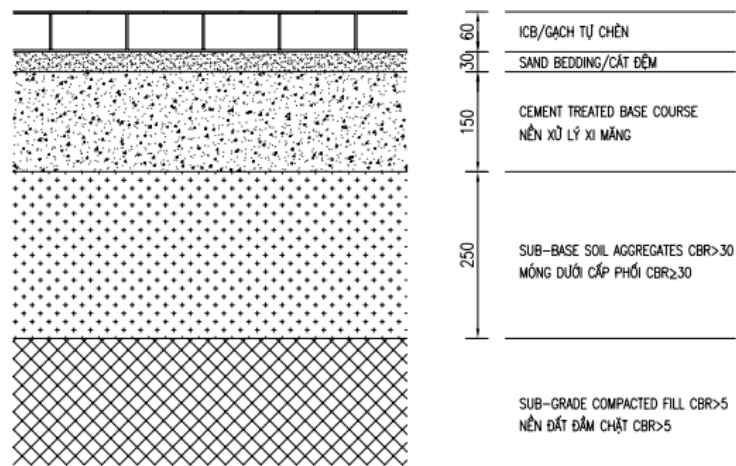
Typical Section of Pavement for Service Boat Berth
